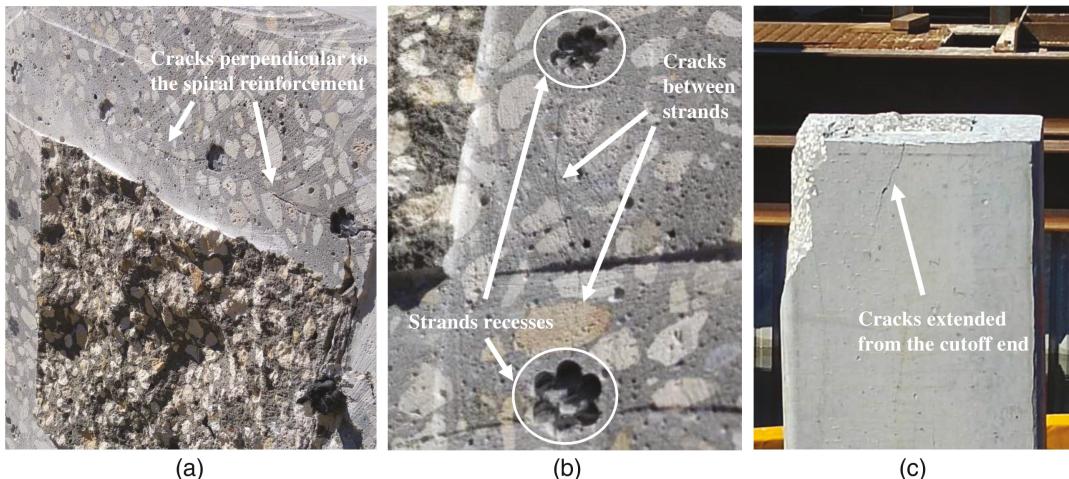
Pile cracks (a) perpendicular to the spiral reinforcement; (b) between strands; and (c) extended from the cutoff end of the pile. (Images by Thomas Cadenazzi.)
